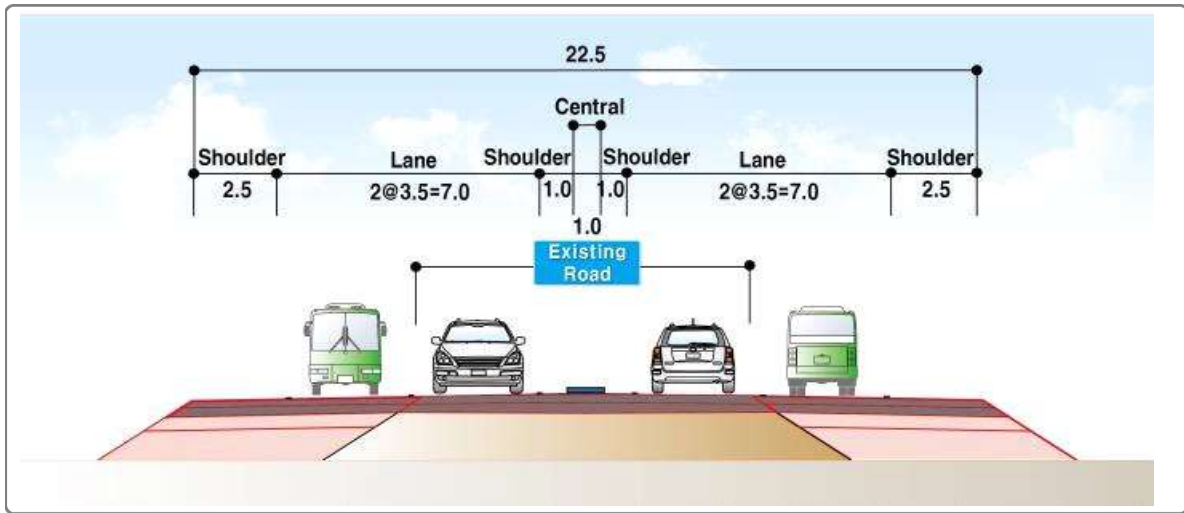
Standard cross-section: Urban Retaining Wall (Sta. 13+606-14+256)
